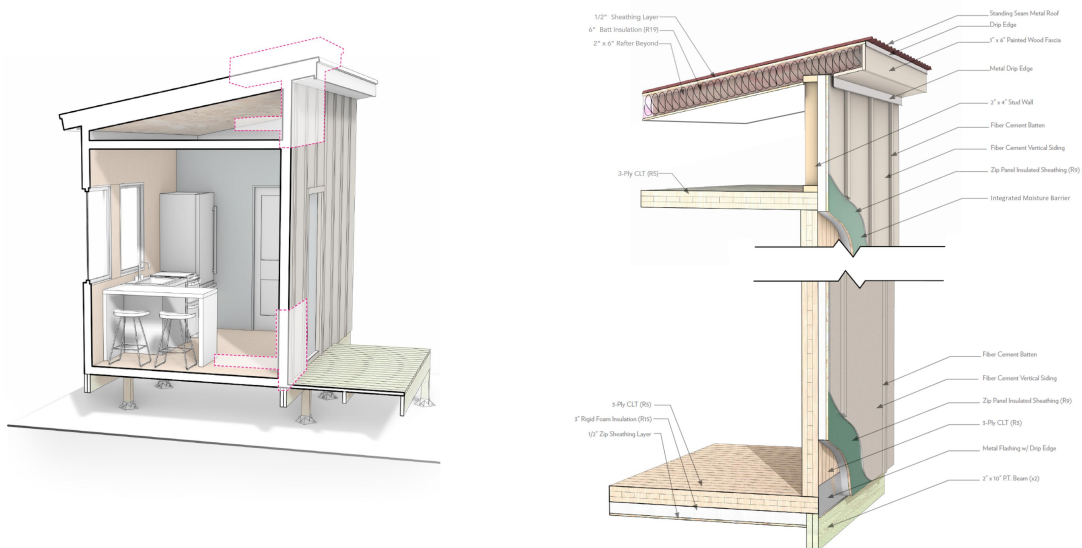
Cross-sections depicting unit finishes and on-site completion measures. Illustration by: (Ryan Bing 2021)
